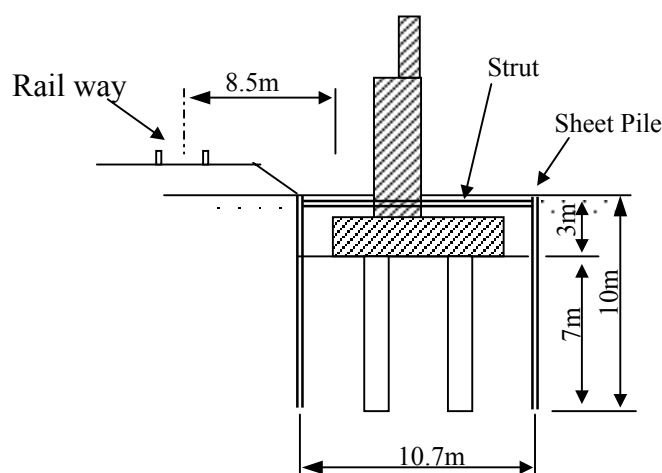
Sheet Pile Cofferdam for Substructure HW No.12 (Railway)
